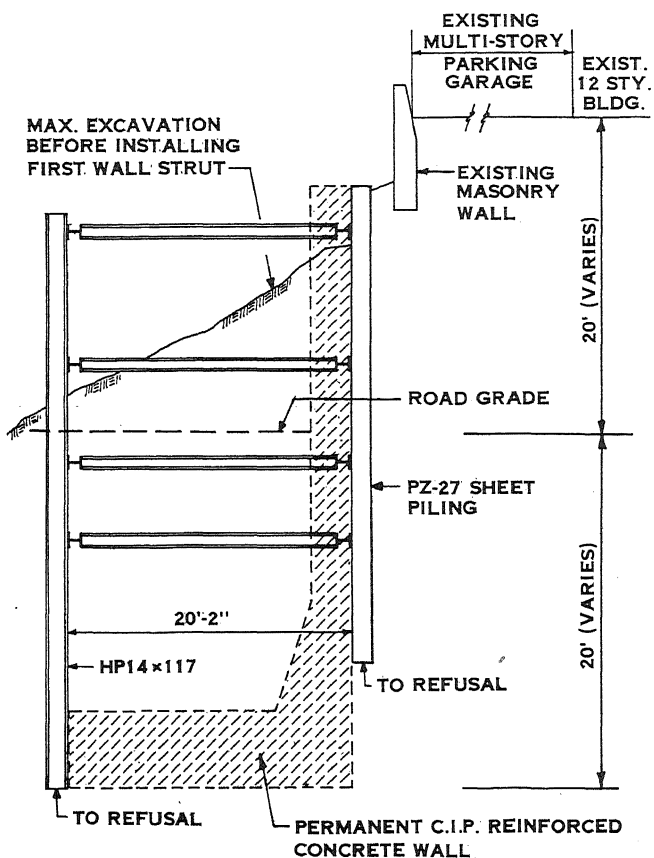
ORIGINAL RETAINING WALL SCHEME
